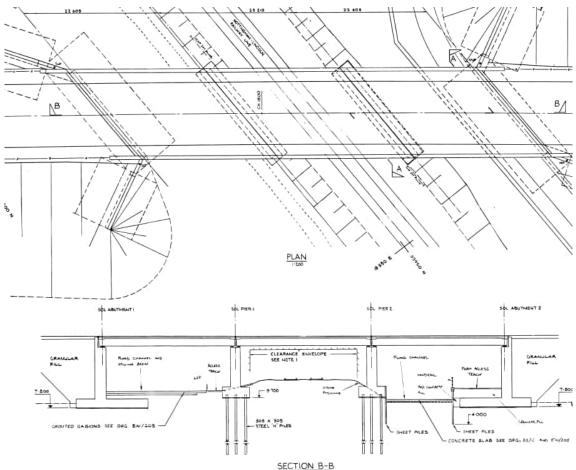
Extract from as-built GA drawing 3451/B3/01/A of bridge B3
